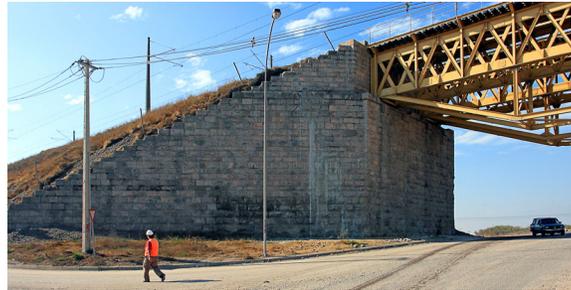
Abutment Wall Supporting the Maipu River Railroad Bridge South of Santiago.
